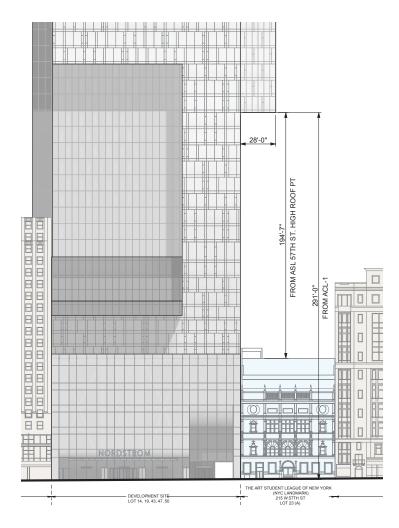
Section drawing of the Nordstrom tower showing cantilever projecting over the Art Students League
